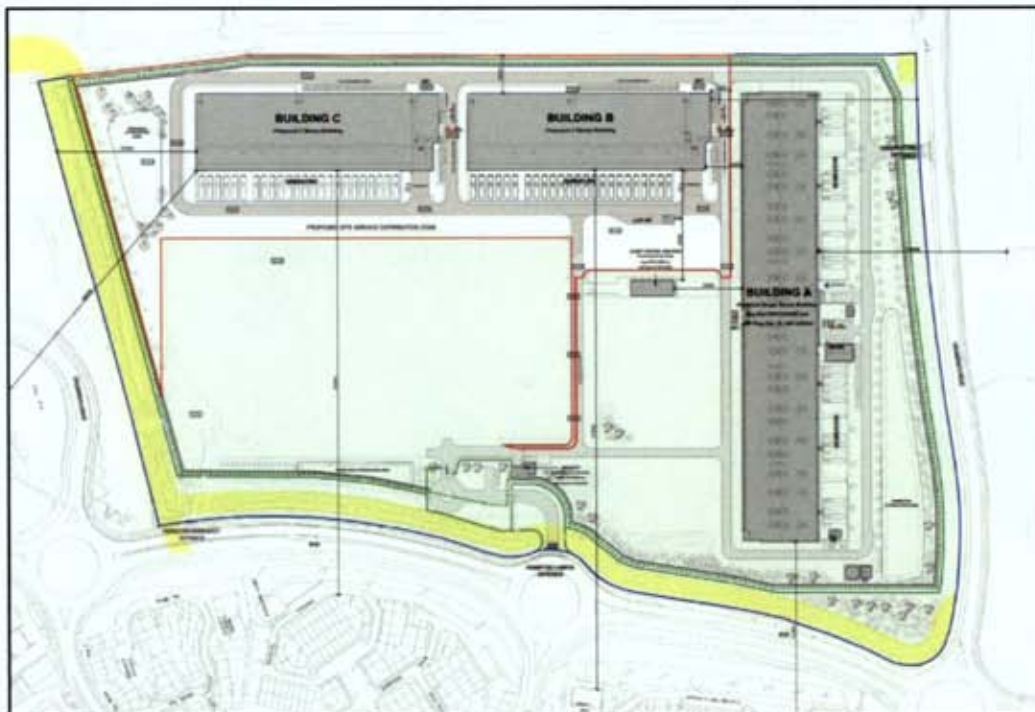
Extract from the site layout plan of the permitted scheme for Buildings B and C.
